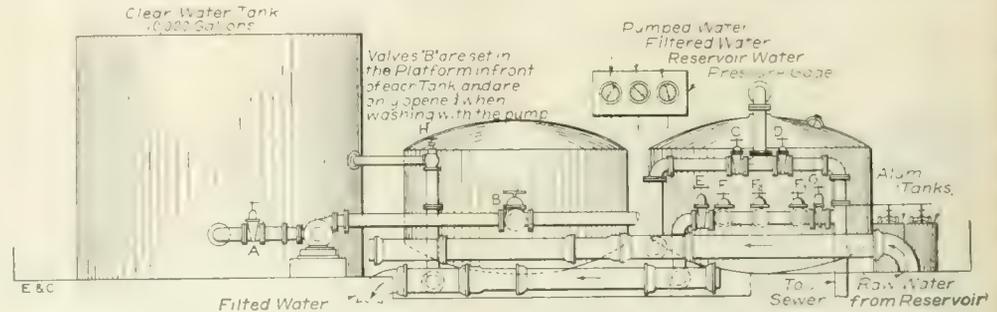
Elevation of Two Pressure Filter Units and Clear Water Tank, New Canaan, Conn., Showing Piping for One Unit Only.
